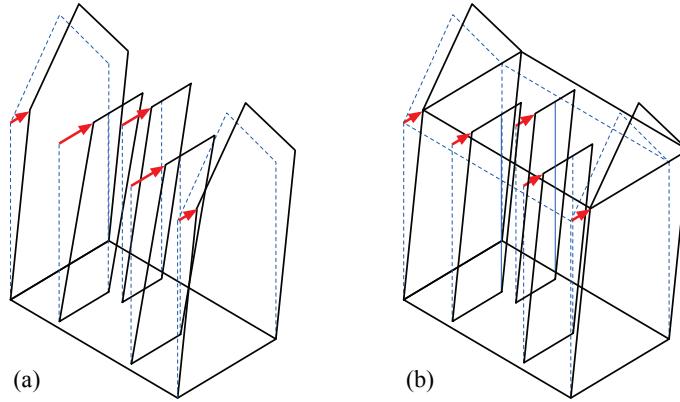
Horizontal displacements of the transversal walls subjected to seismic loads. Schematic sketch.
